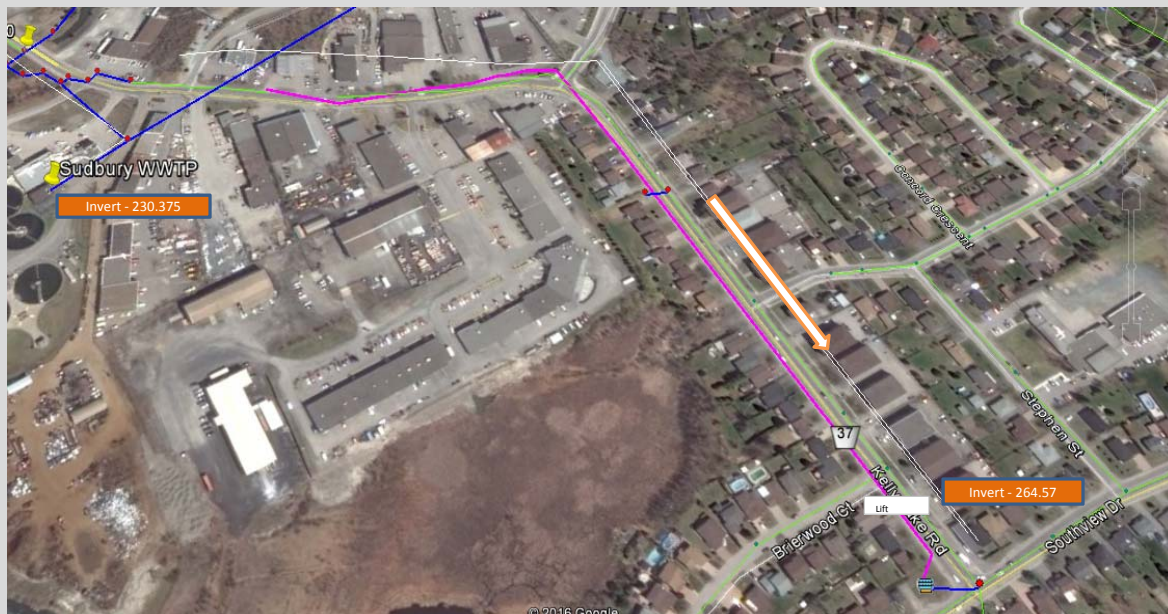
Invert Elevations surrounding the Southview Pumping Station
